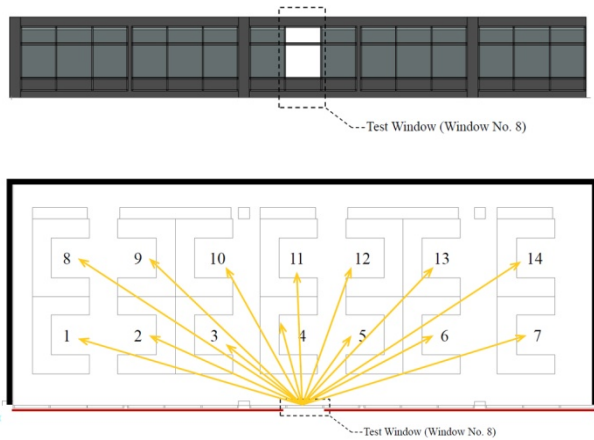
Test window elevation and plan showing locations of direct sunlight penetration.
